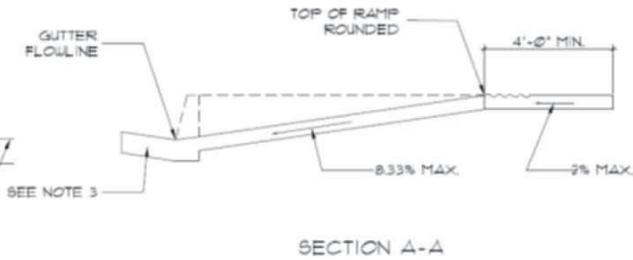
Plan view of a typical concrete perpendicular curb ramp by SSA.
